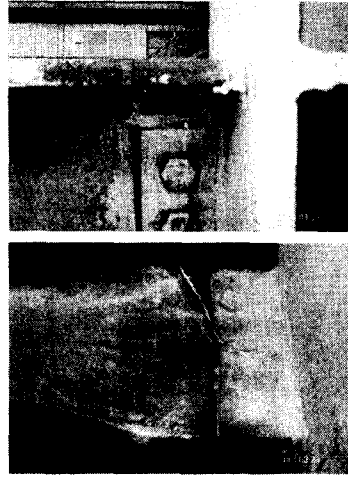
Beam top flange fracture of specimen DB700-MB at 3% story drift cycle
